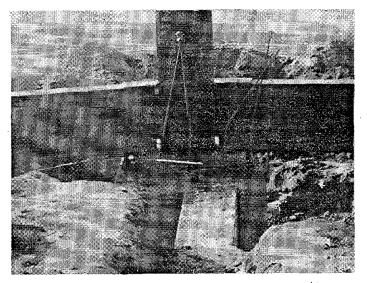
Example of steel grade beams moment-connected to bottoms of columns.
